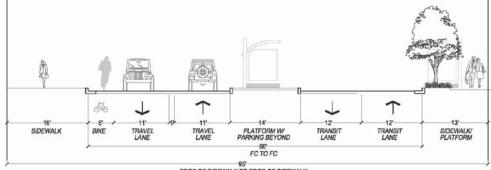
Recommended cross-section looking north with two-way transit between 26th Street S. and 27th Street S.
